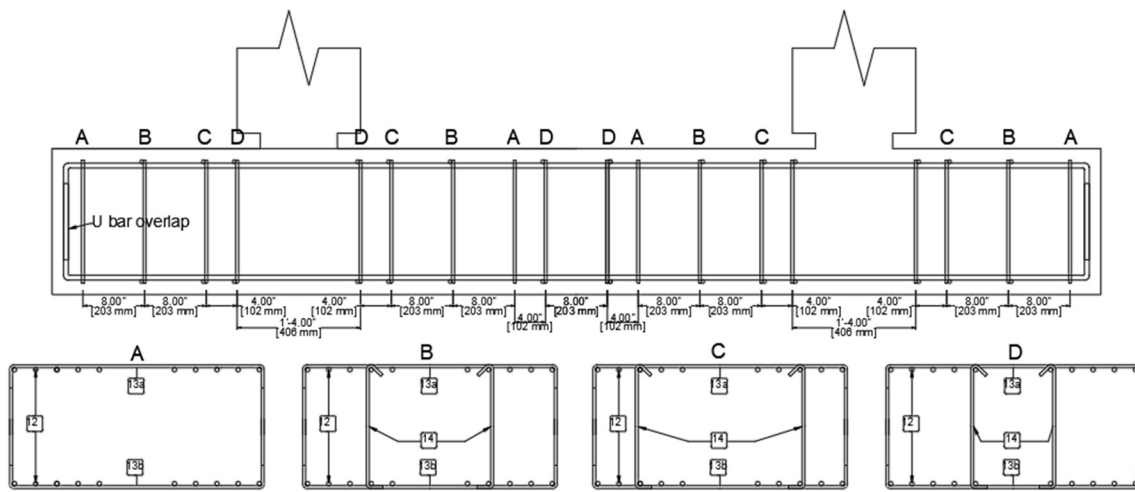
Elevation view of locations of footing reinforcement cross-sections
